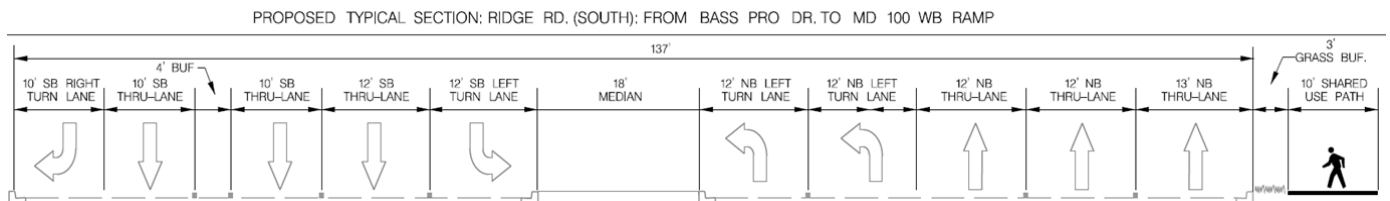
Proposed Cross-section for Bass Pro Dr to westbound MD 100 ramps.
